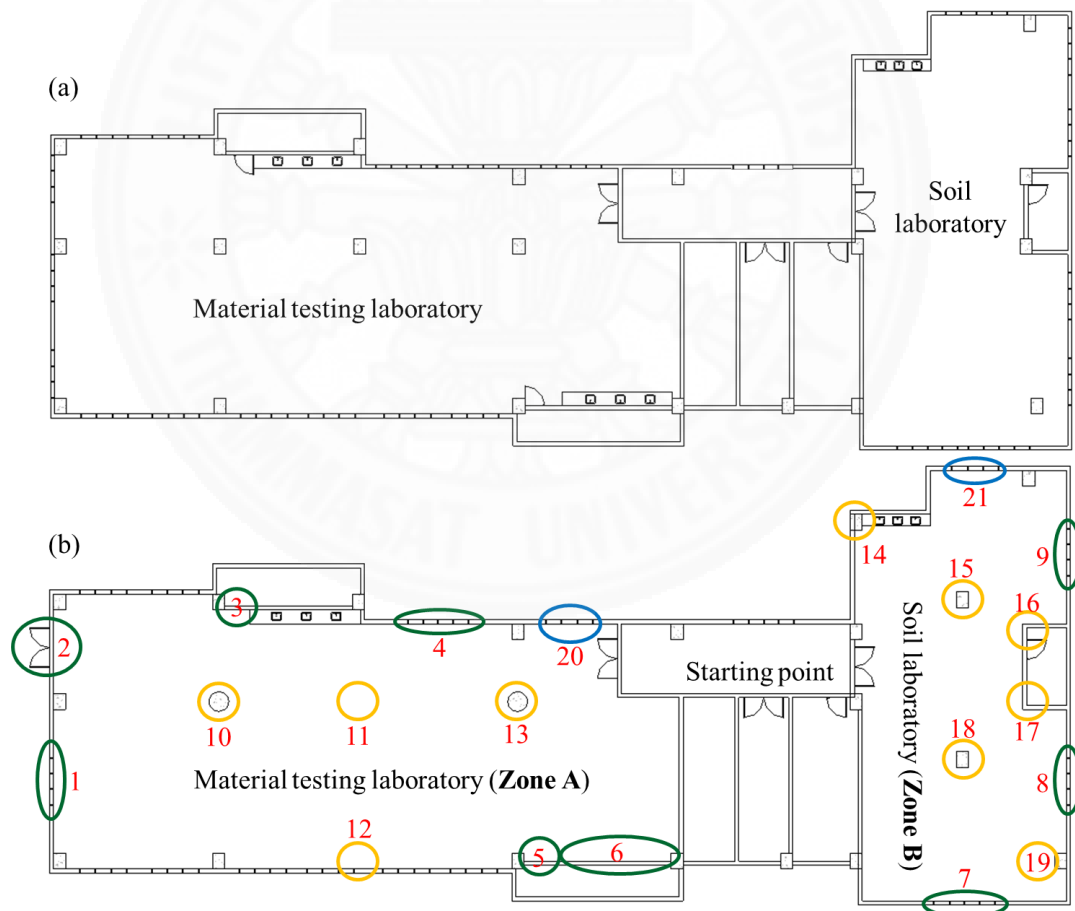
The 2D drawings of the Civil Engineering Laboratory: (a) the correct floorplan and (b) the error floorplan.
